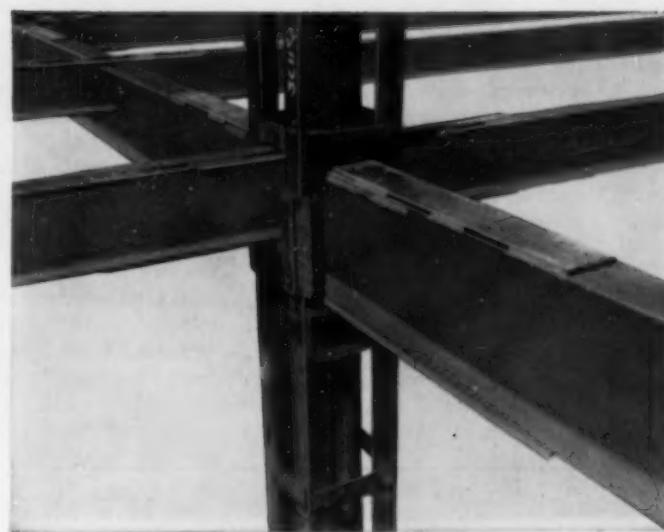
Main girders, supported on cross channel plates, run directly through main columns. Four column angle sections shown are for temporary support during erection and later serve for composite steel and concrete columns. This construction is used on a Los Angeles Bell Telephone Building extension.
